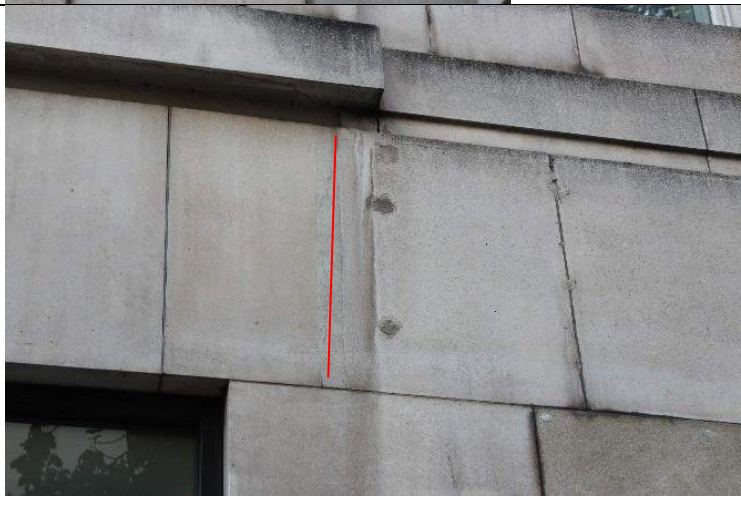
Bucknall St warehouse, showing cracks behind the drain and around the windows
